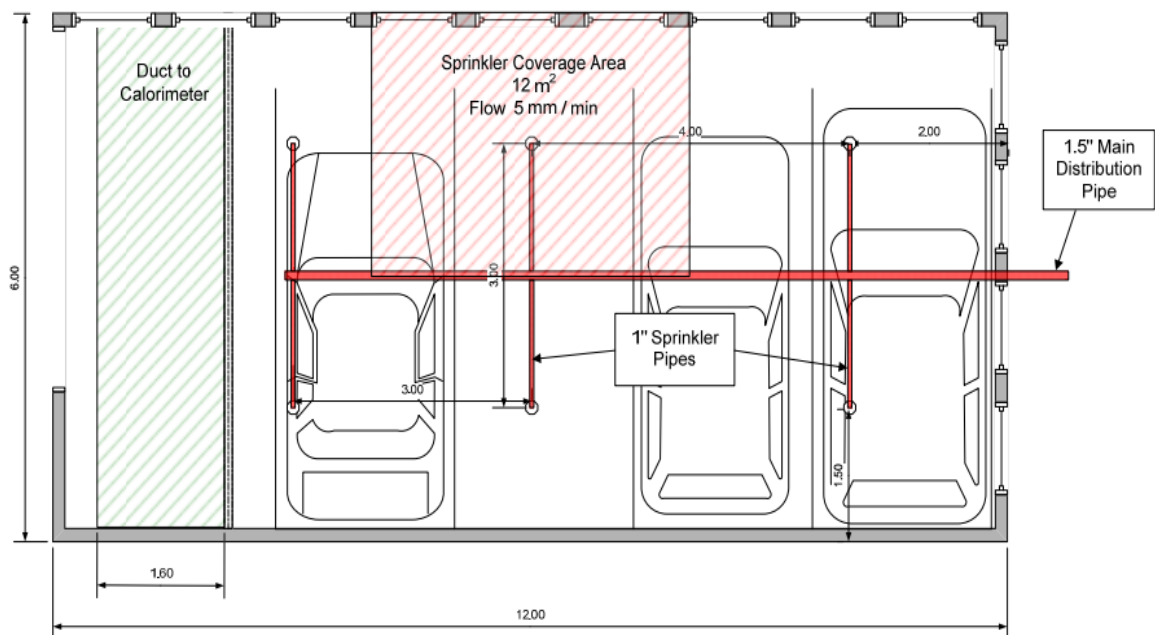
Tested sprinkler layout (BRE, 2010)
